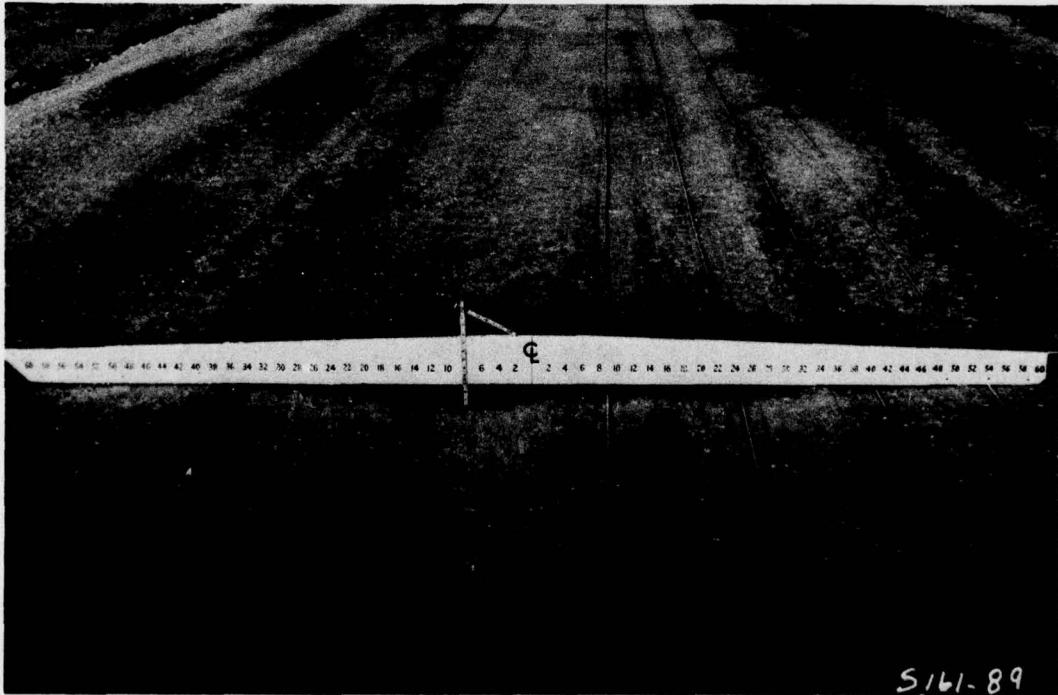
Test Section No. 4, item 1, after 480 passes of load wheel
